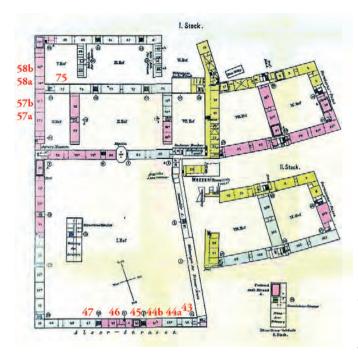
Building Plan of Vienna's Allgemeines Krankenhaus according to J. F. Wagner 1886
